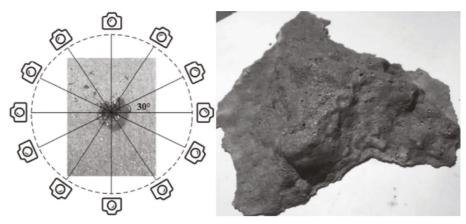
Photographing of pavement damage and concrete patch [64].
